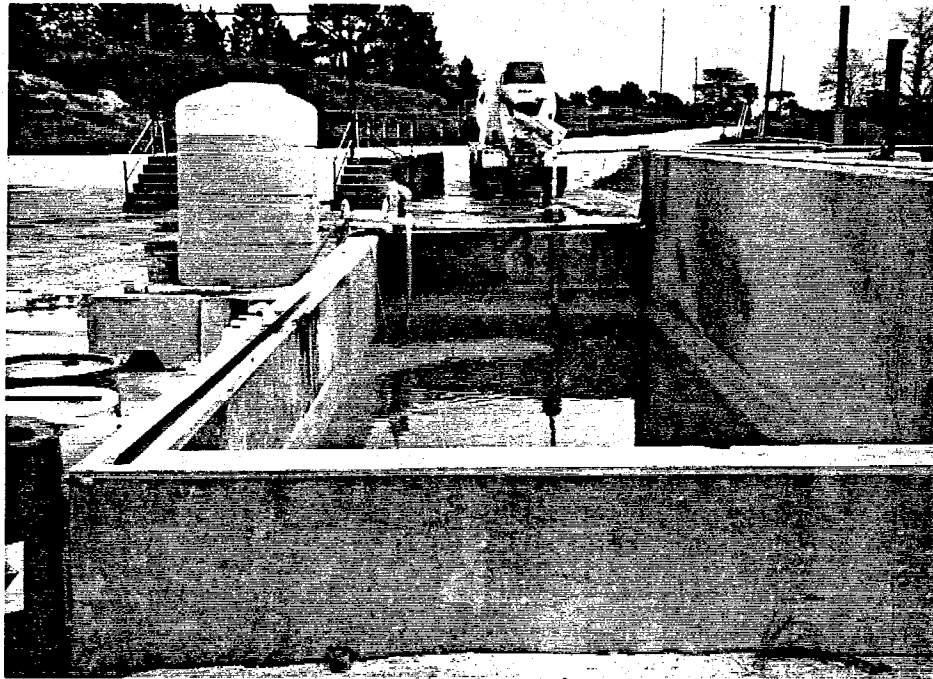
Sample location for Type II wastewater from Ewell plant in Davenport, FL.
